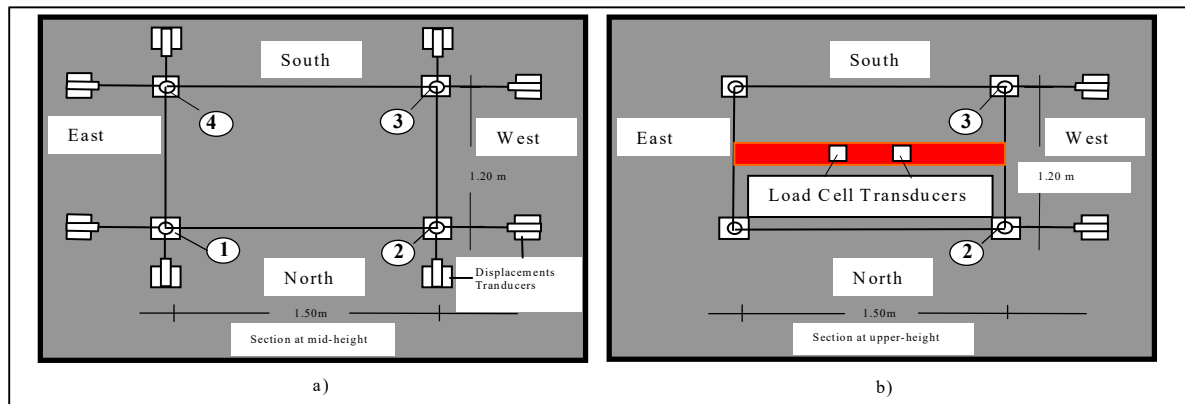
a) Plan of transducers position in scaffolds mid-height A-A. b) Plan of transducers position in scaffolds top level B-B.
